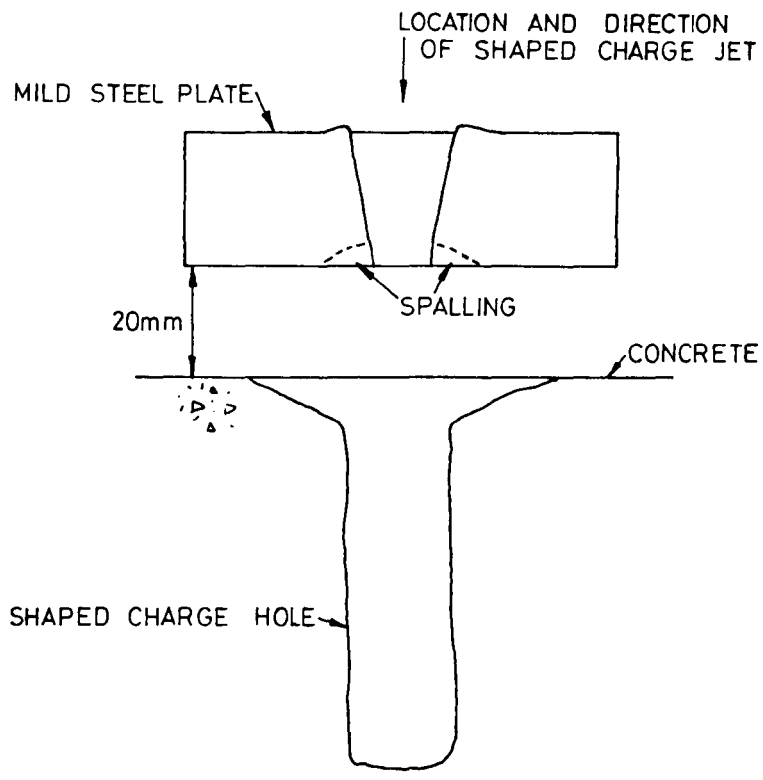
CROSS SECTION OF A TYPICAL HOLE FORMED IN SAND/GRAVEL CONCRETE BY A 43g COPPER SHAPED CHARGE JET AFTER PERFORATING A STEEL PLATE
